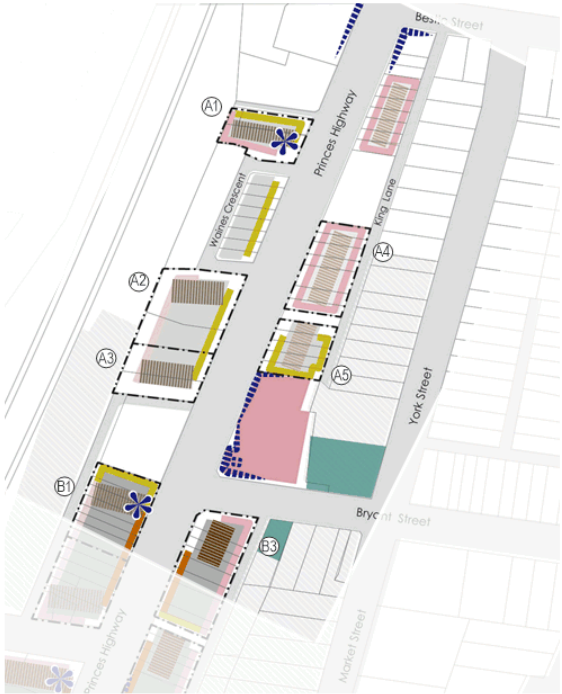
AREA A - BUILDING CONFIGURATION & MASSING
